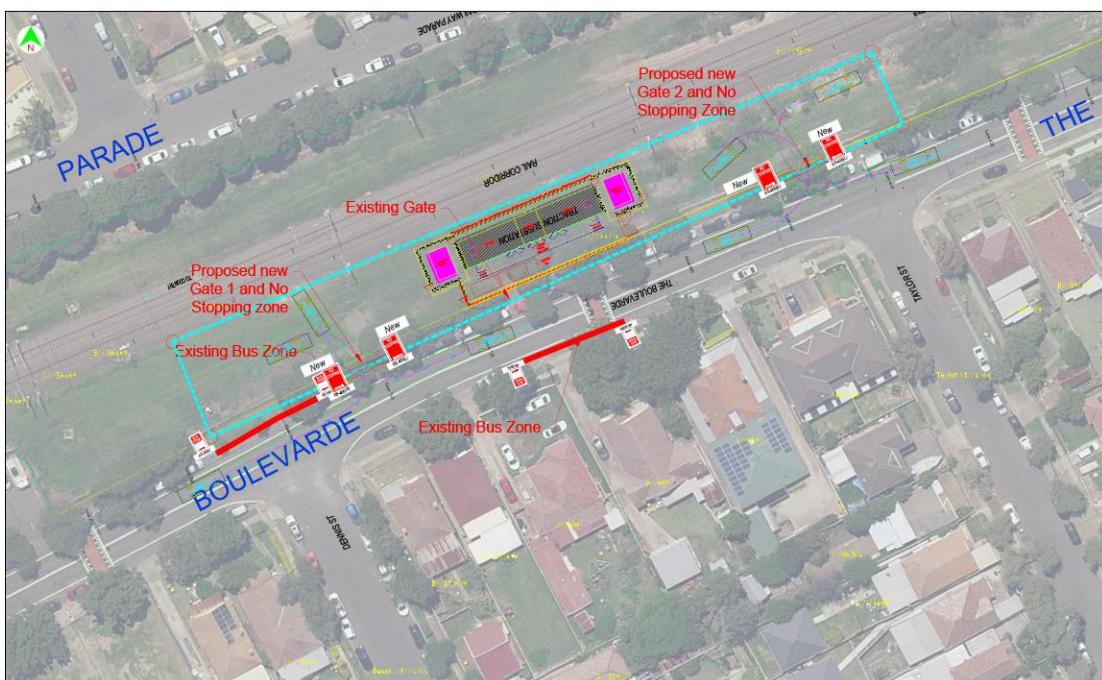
Lakemba traction substation site plan (refer to Appendix A for details)
